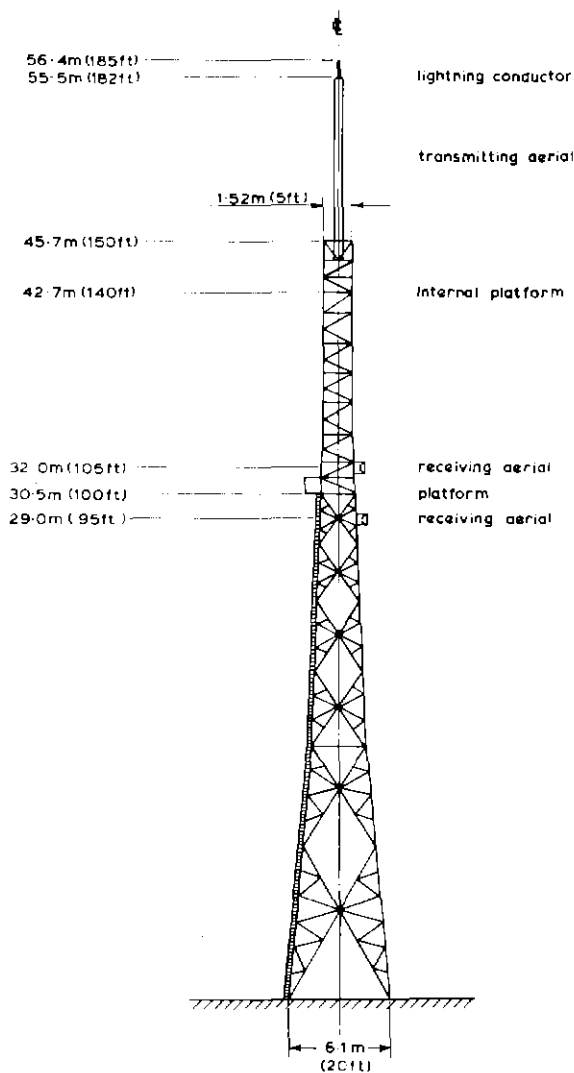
Standard 45.7 m (150ft) tower and aerial system
